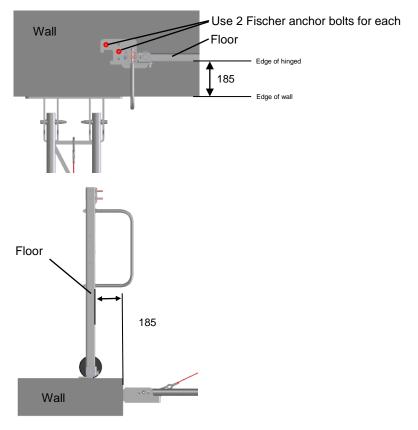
Mount hinged floor gate to the floor of the applicable storey (variant 3)
